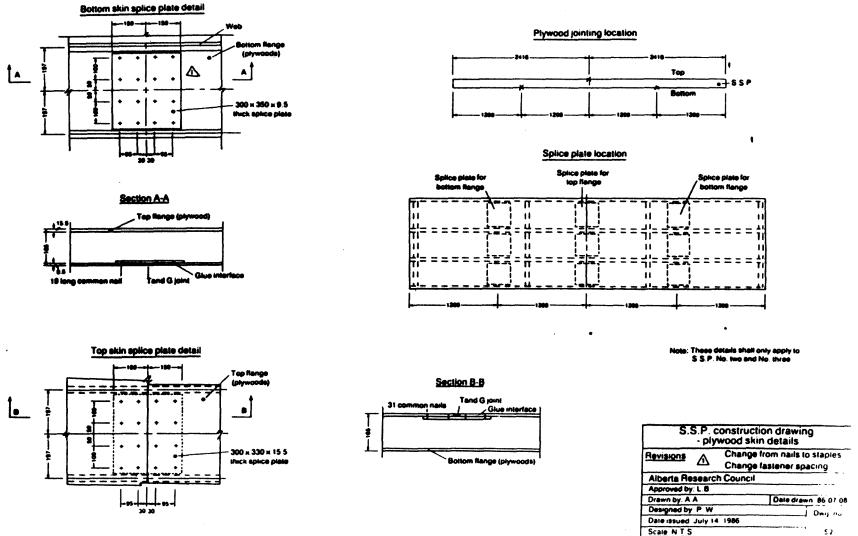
Stressed skin panel construction drawing: plywood flange details.
